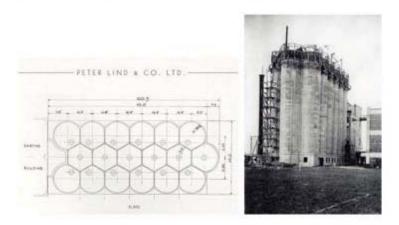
Showing the construction of the reinforced concrete Shredded Wheat Factory c.1924 [© Welwyn Garden City Heritage Trust website]
